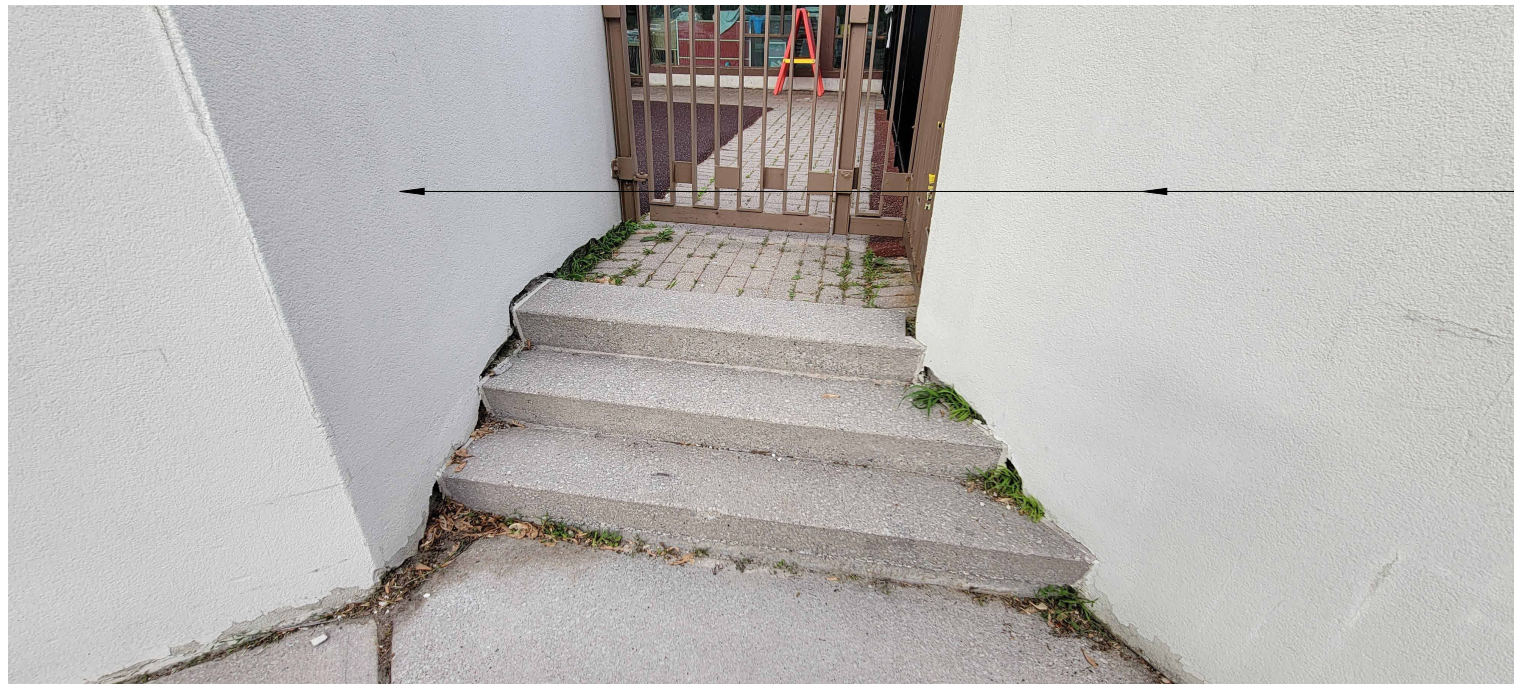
DEMOLISH EXISTING EXTERIOR STAIR. CONSTRUCT NEW CONCRETE STAIR
